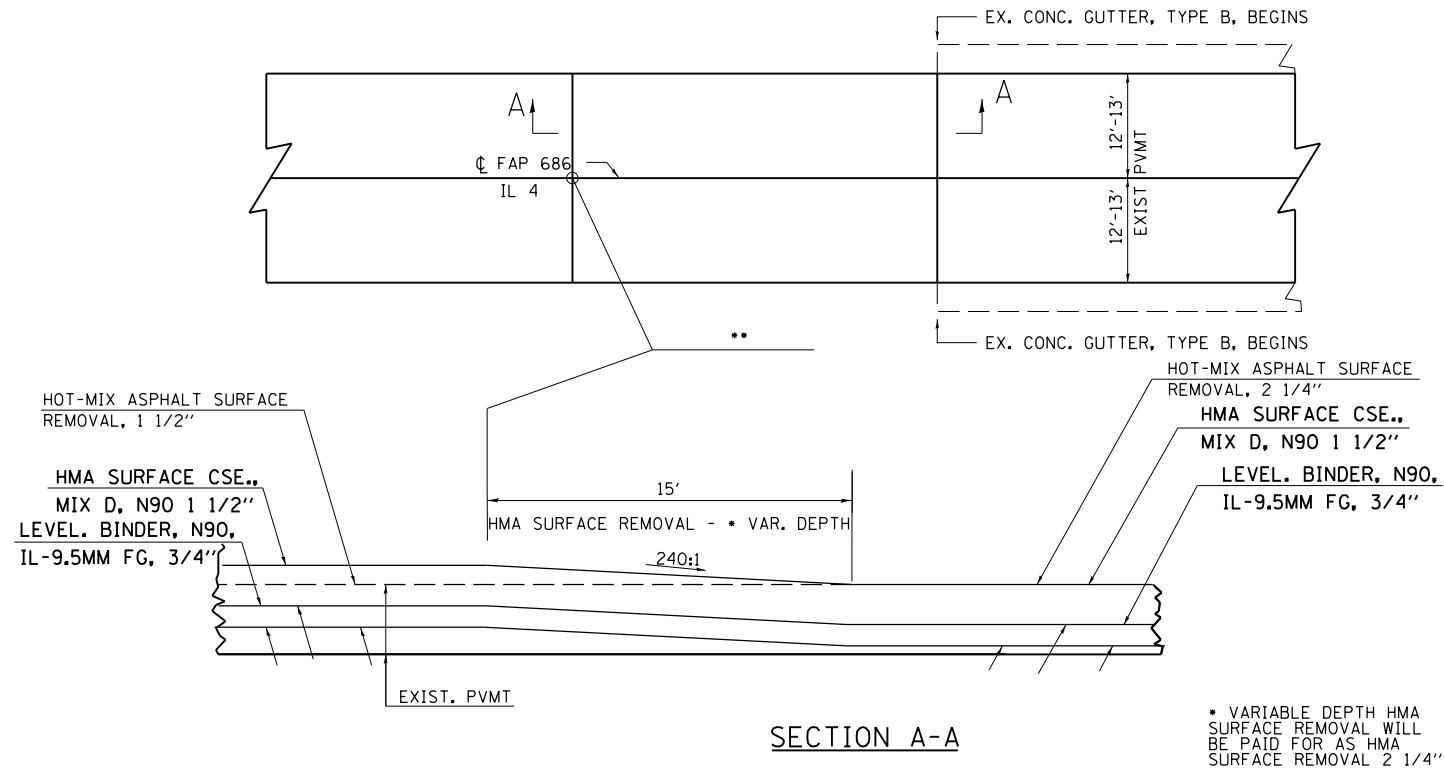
DETAIL: HMA SURFACE REMOVAL - BUTT JOINT
